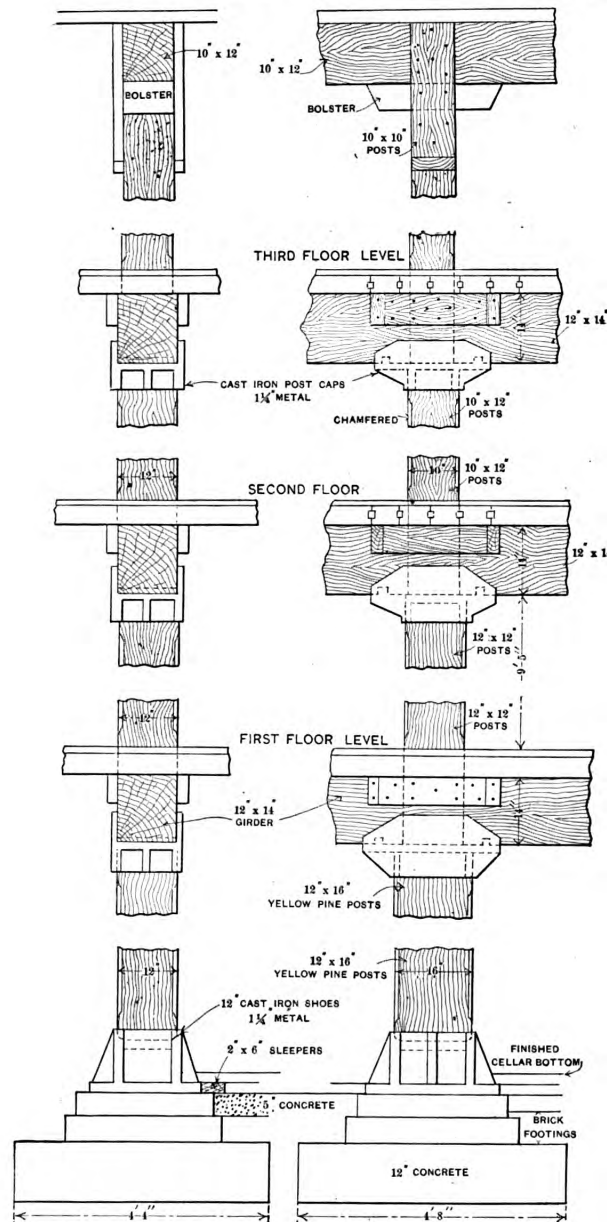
Details of Posts and Floor Beam Connections. Fig. 7. Details of Posts and Floor Beam Connections.
